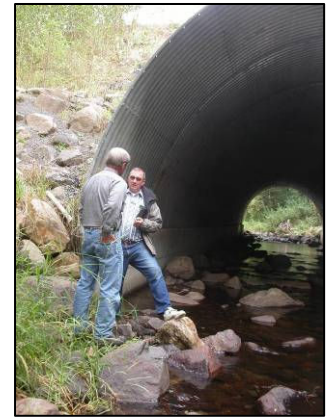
Cedar Creek Before - undersized and impaired Battleground Railroad culvert.
